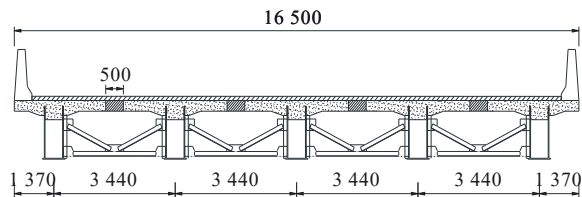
Design of wide girder section (four-girder) (unit: mm)
